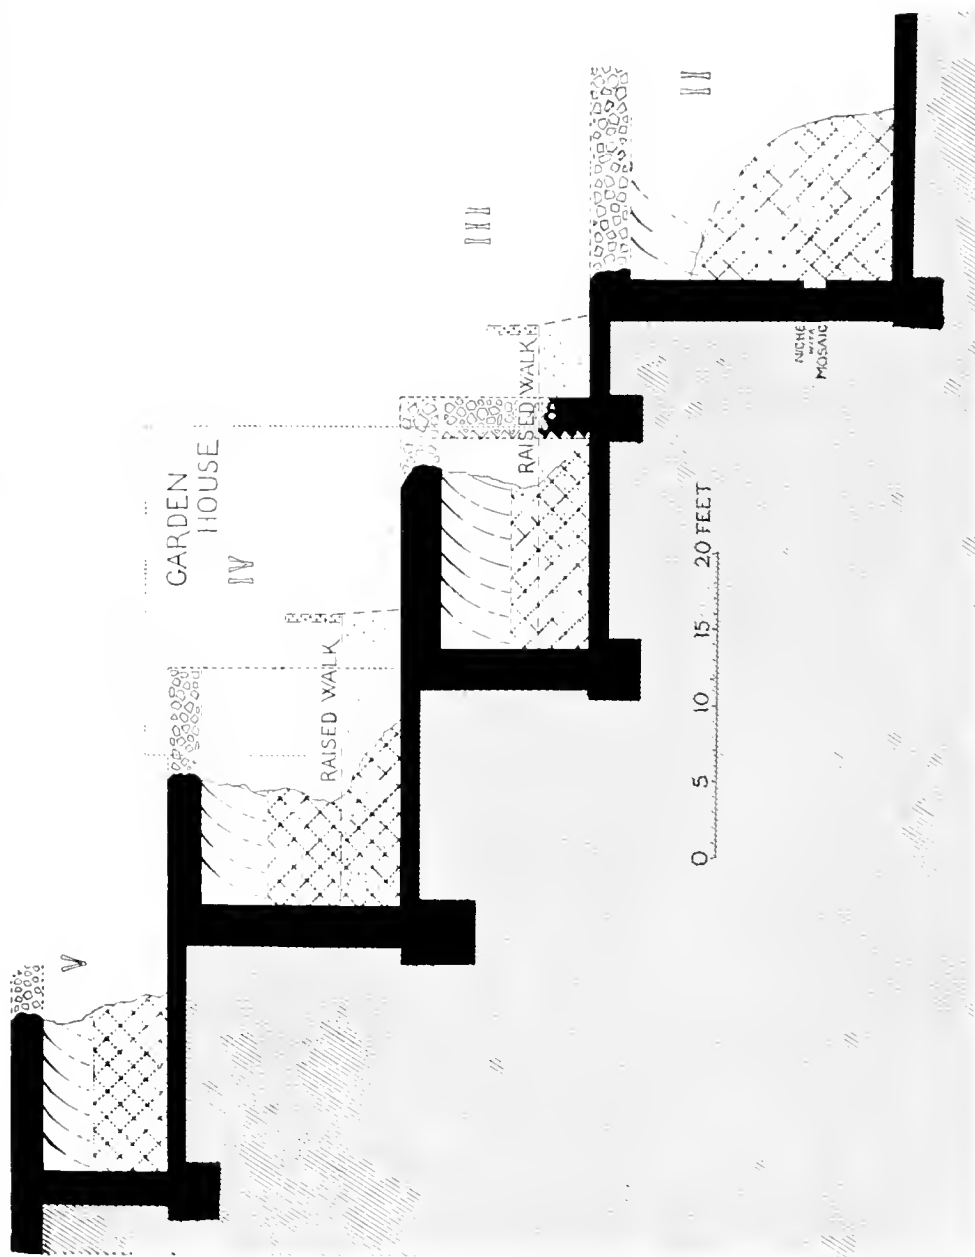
SECTION THROUGH THE SUBSTRUCTIONS AND TERRACES OF FLOORS II-V.
